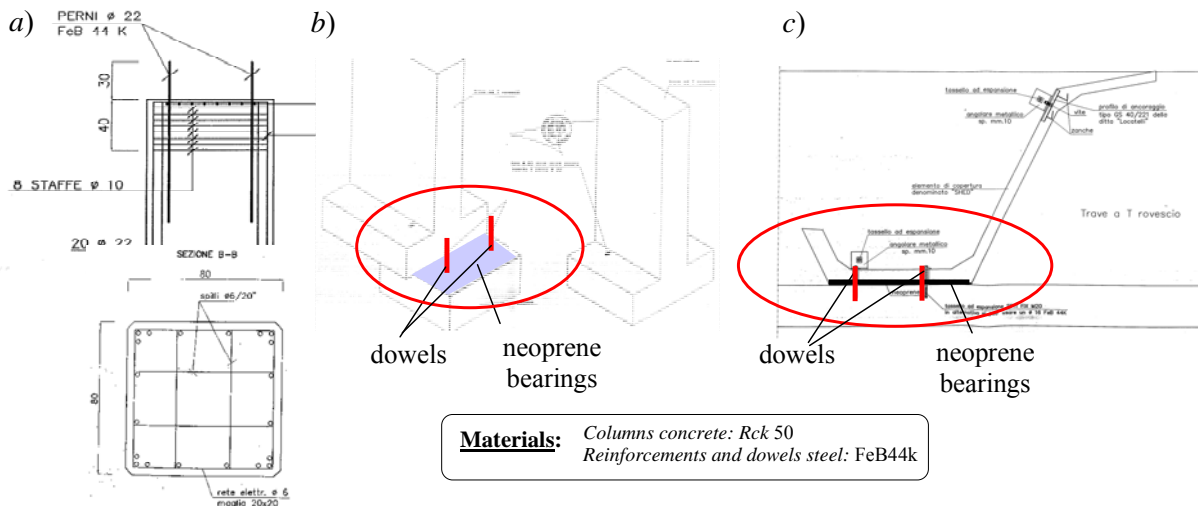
a) Detail of dowels; b) beam-column connections; c) beam-shed connections
